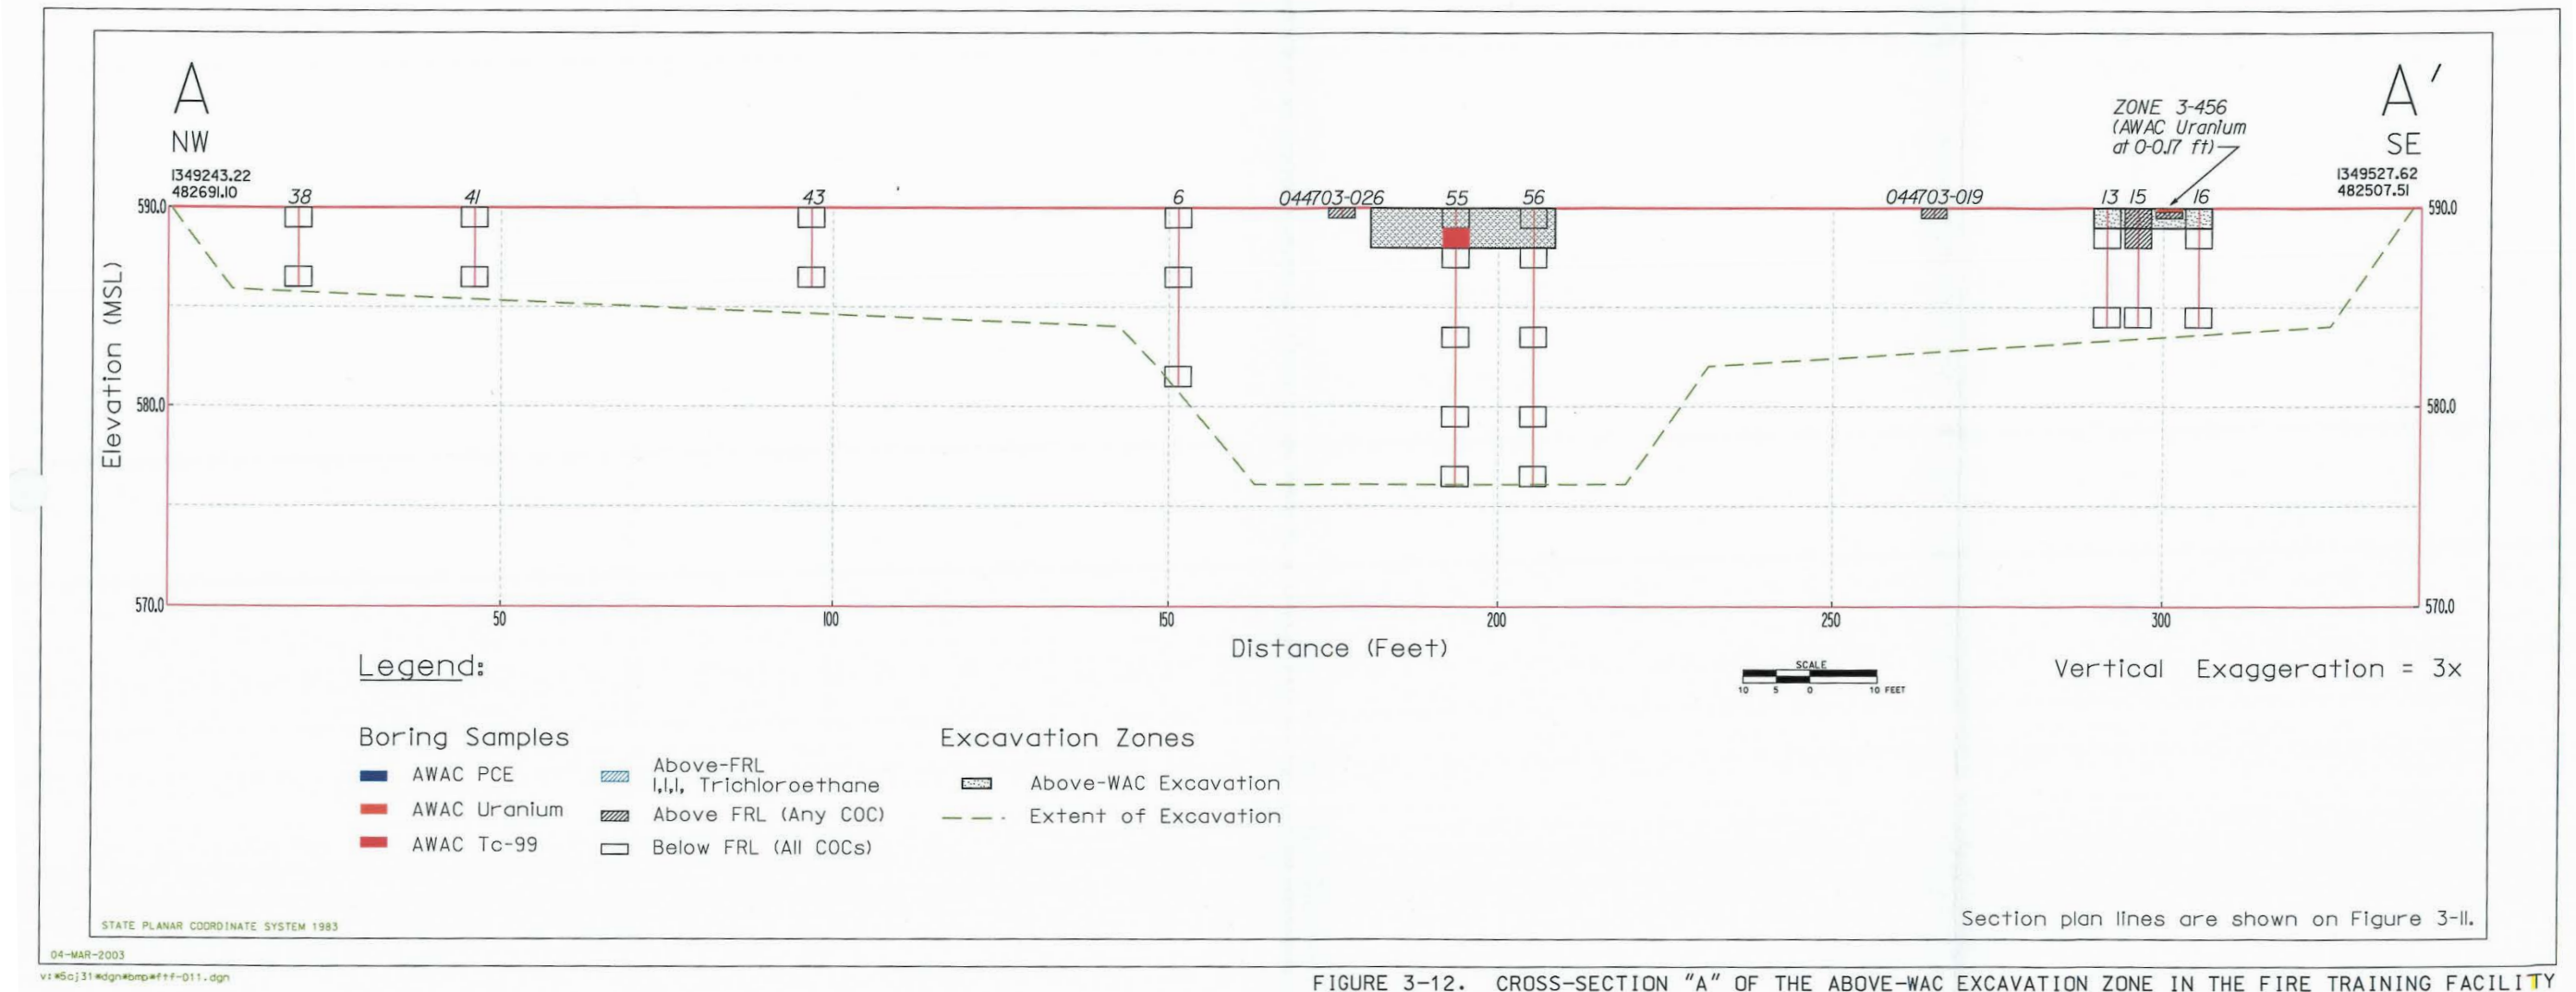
CROSS-SECTION "A" OF THE ABOVE-WAC EXCAVATION ZONE IN THE FIRE TRAINING FACILITY
